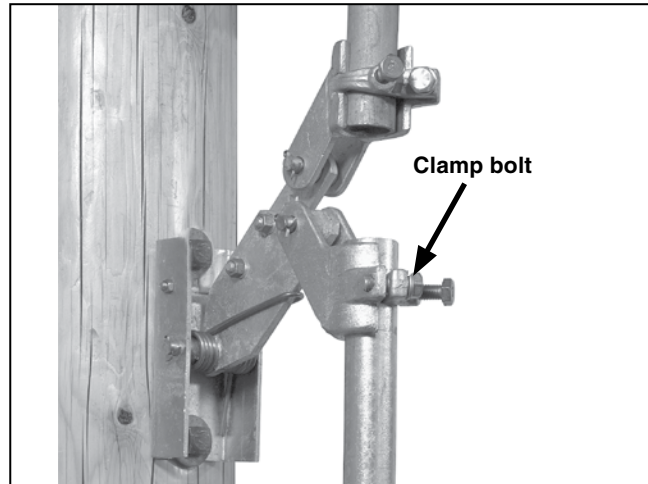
Torquing the clamp bolt at the lowest rod guide (or interphase drive lever) coupling.
